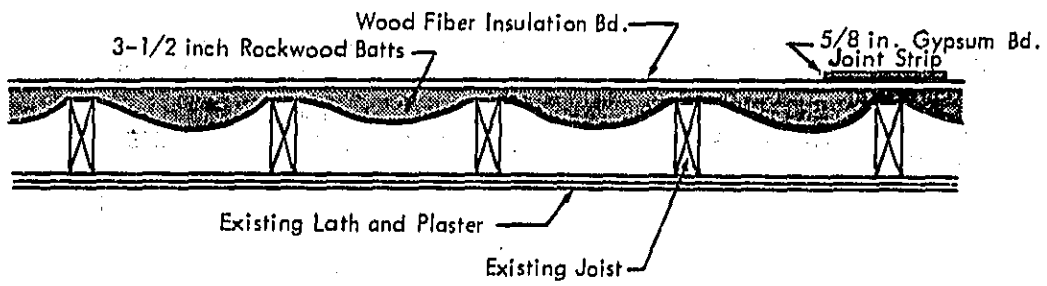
ALTERNATIVE STAGE 3 CEILING TREATMENT
